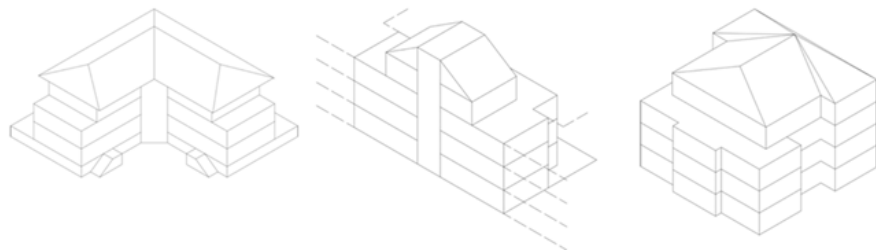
L-shaped, I-shaped and H-shaped buildings in Shoham (Illustrated by the author)
